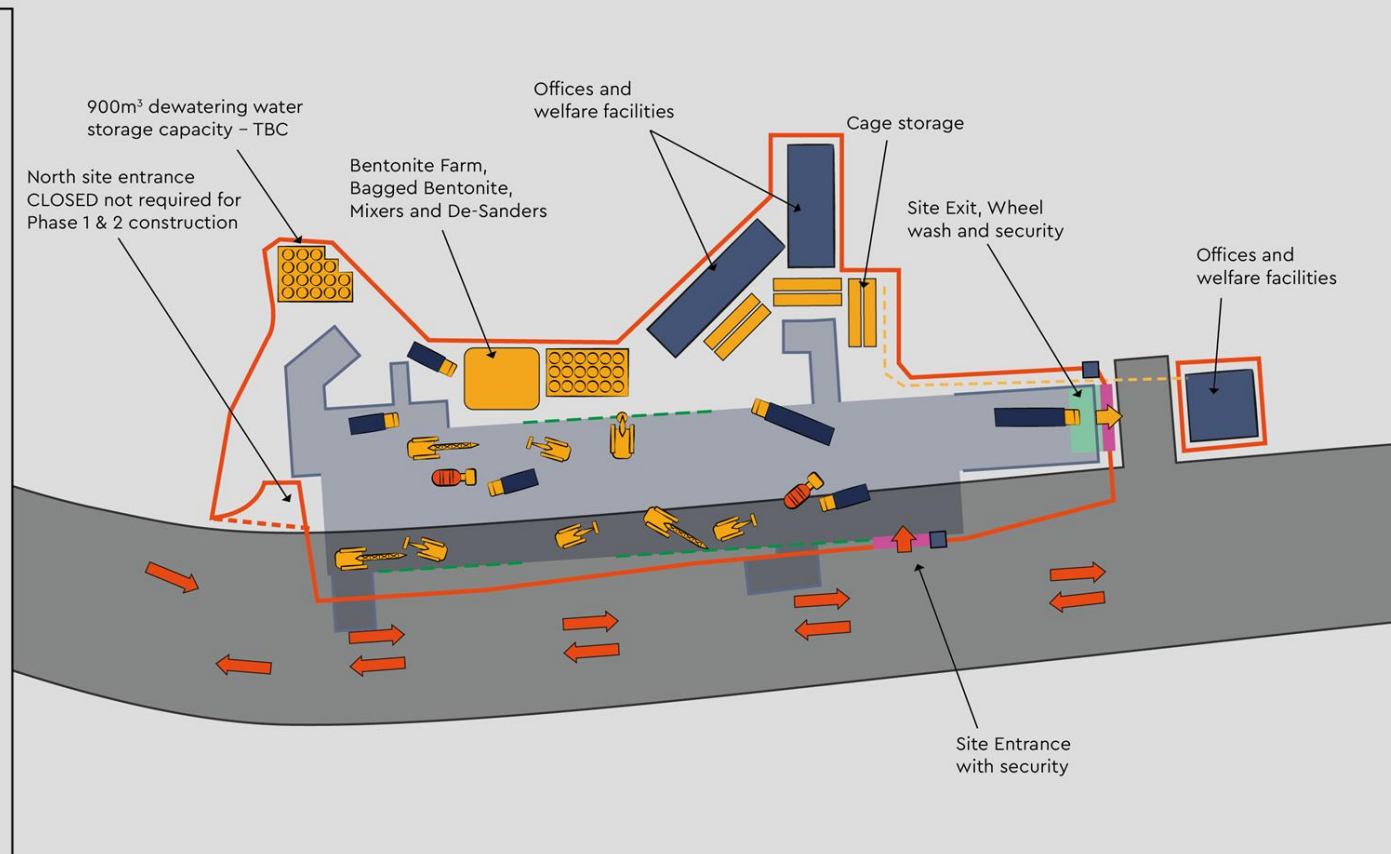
Collins Avenue Station Stage 3 - Diaphragm Wall and Main Piling Construction
